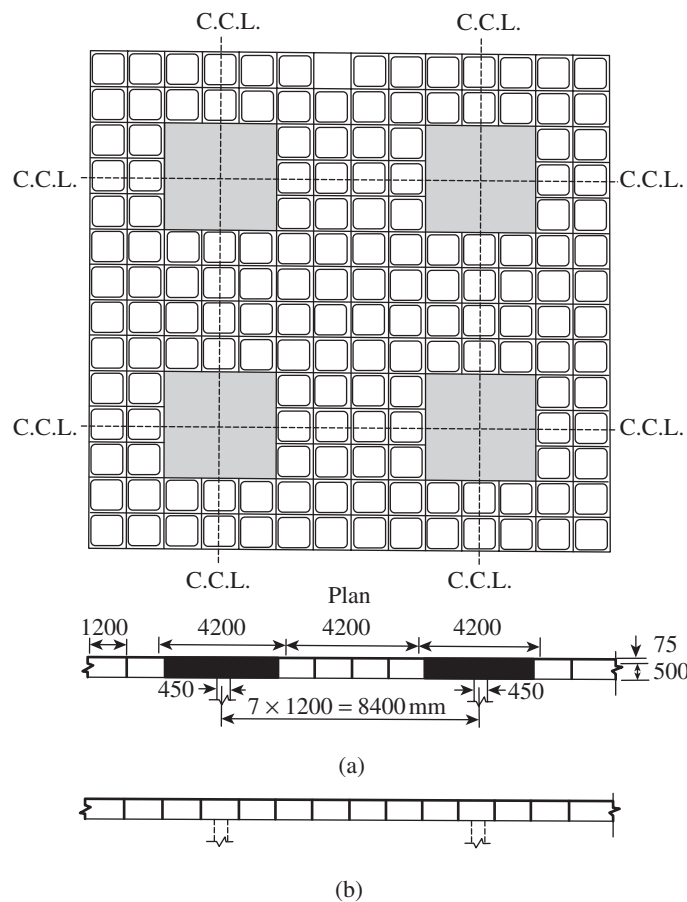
Waffle slab of Example 11.8 (a) Section at column strip (b) Section at middle strip
